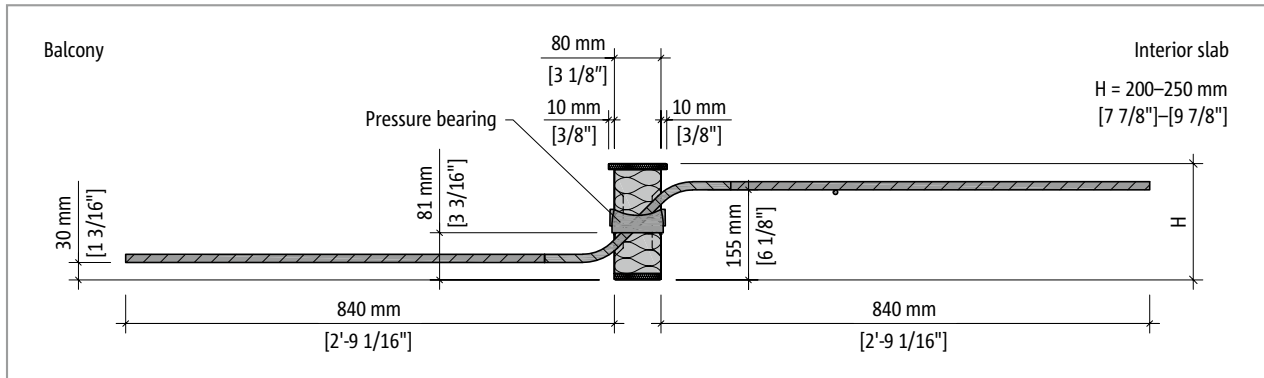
Schöck Isokorb® T Type CQ-V12: Product cross-section
